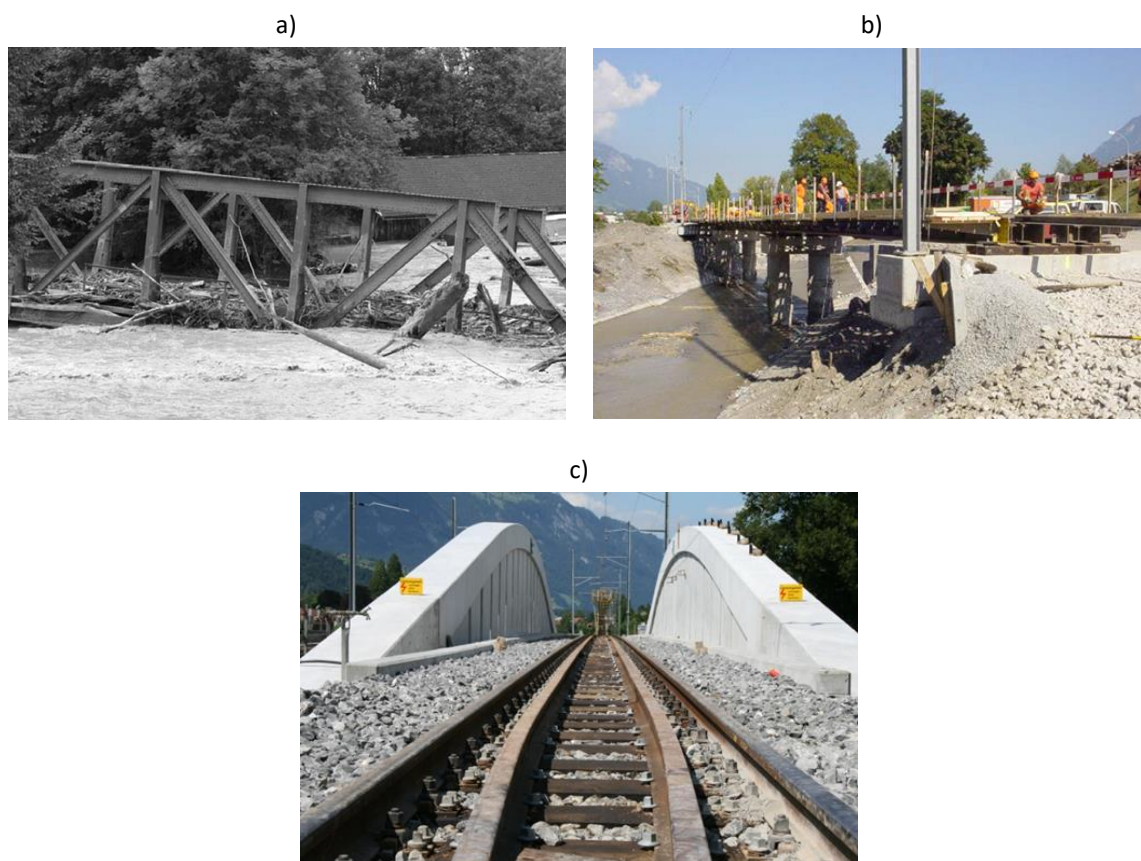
Damage and recovery due to cyclone event in Switzerland; a) the failure of a Melchaa rail bridge, @Civil Engineering Office in Kanton Obwalden; b) the provisional bridge, @dsp.ch; c) the new post-tensioned concrete bridge, @dsp.ch.
